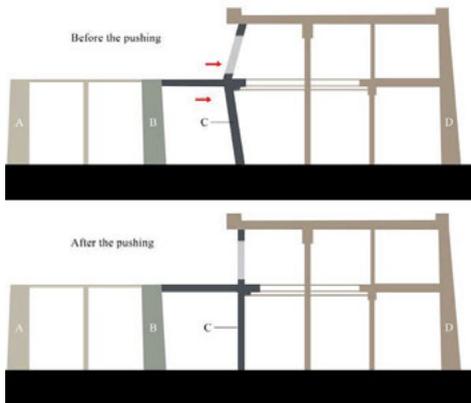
Schematic view of the structural intervention concept. A - rebuilt porch (phase 1); B - tilted wall of the entrance with paintings; C - mixed structure on two storeys with paintings (phase 2); D - rest of the temple (phase 3).
